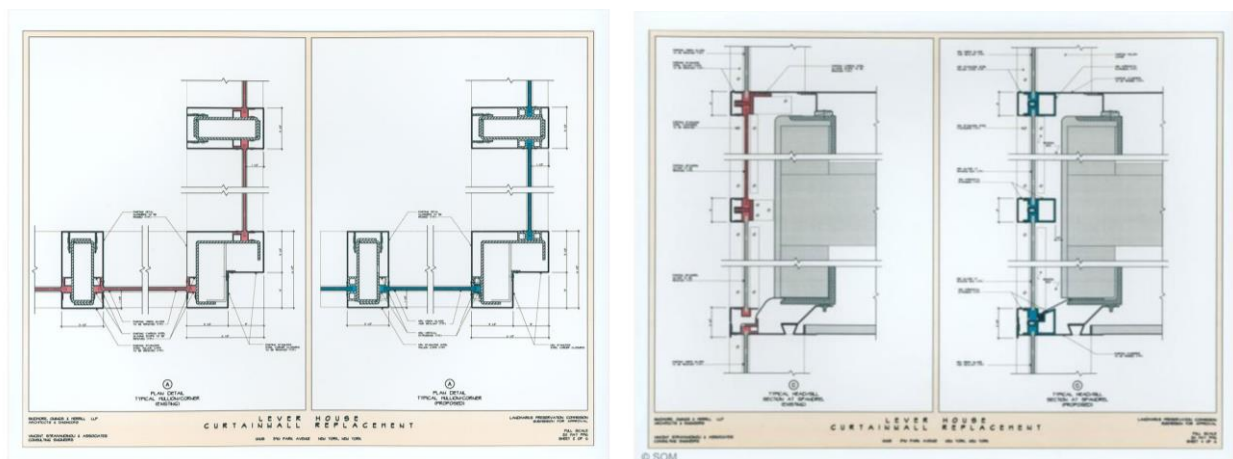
Lever House curtainwall details before and after the restoration job by SOM—horizontal details of typical mullions (Left) and vertical details of typical horizontal meeting rails (right). (Image courtesy of SOM).
